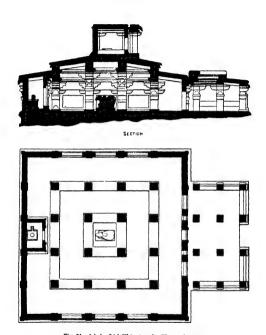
Ashole, Lad Khan temple: Plan and section.
